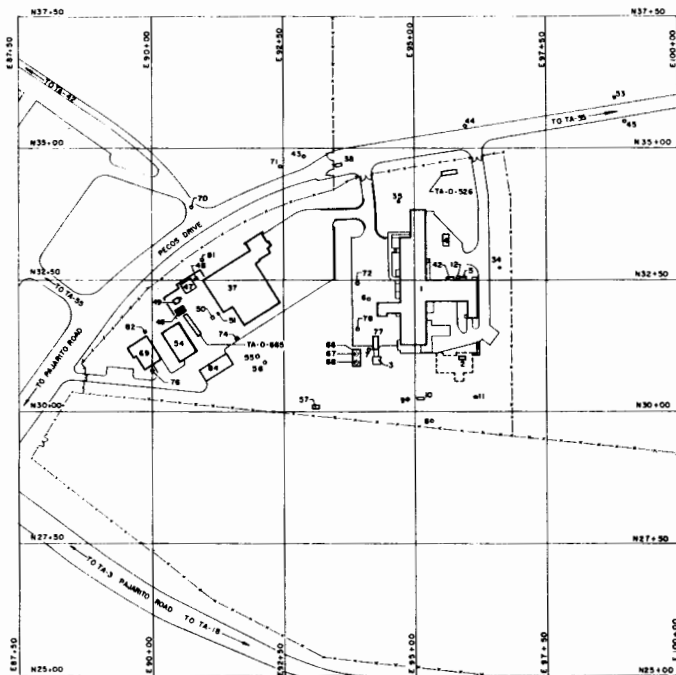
Structure Location Plan for TA-50 - WM Site
